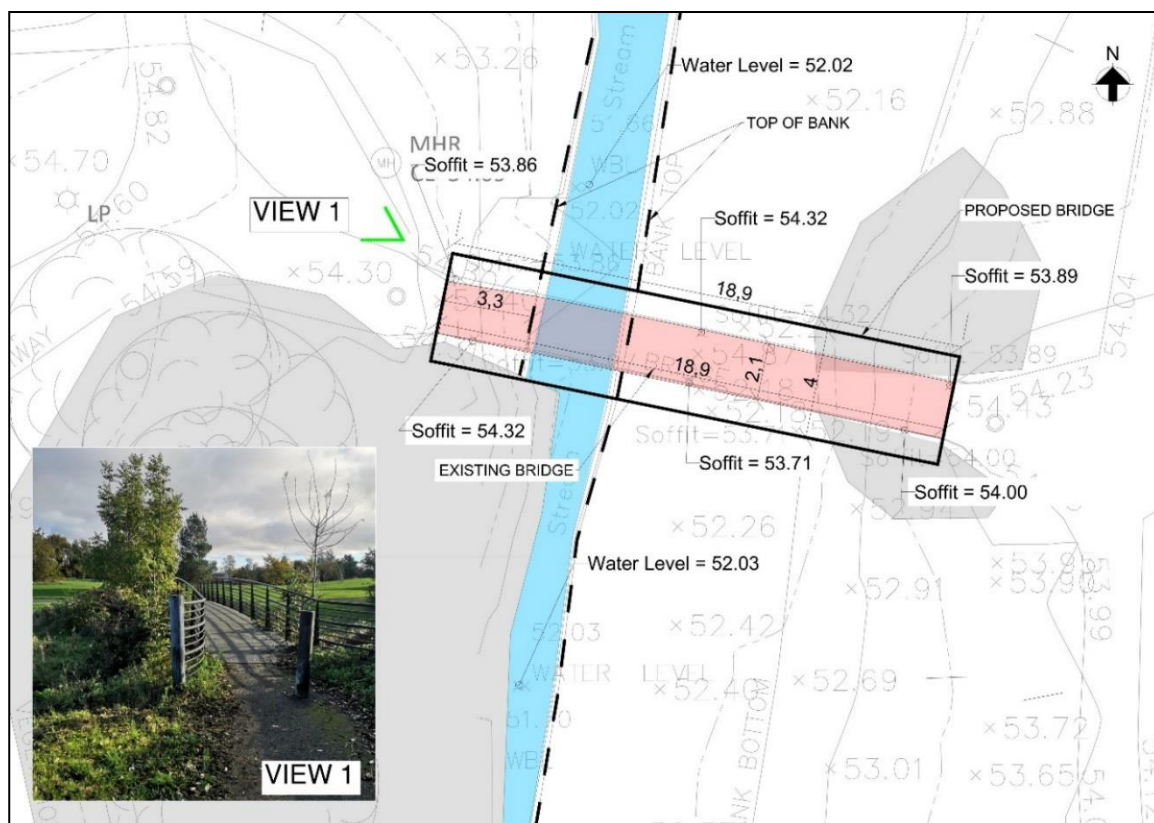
Plan View of Existing and Proposed River Griffeen Crossing No.1
